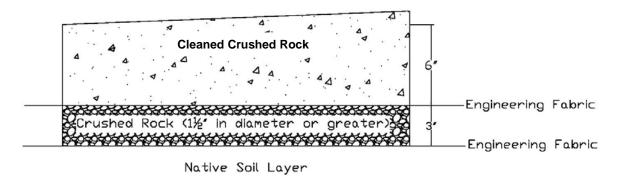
Cross-Section Drawing for Proposed Perimeter Road Wetland Crossings
